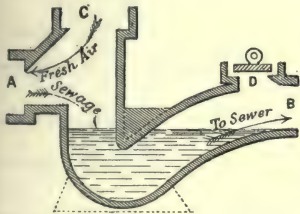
Buchan's Ventilating Trap, with Access Pipe.
